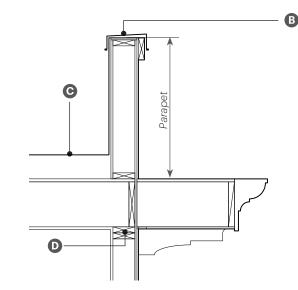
D Section detail of Highest Top Plate for parapet and flat roof.
